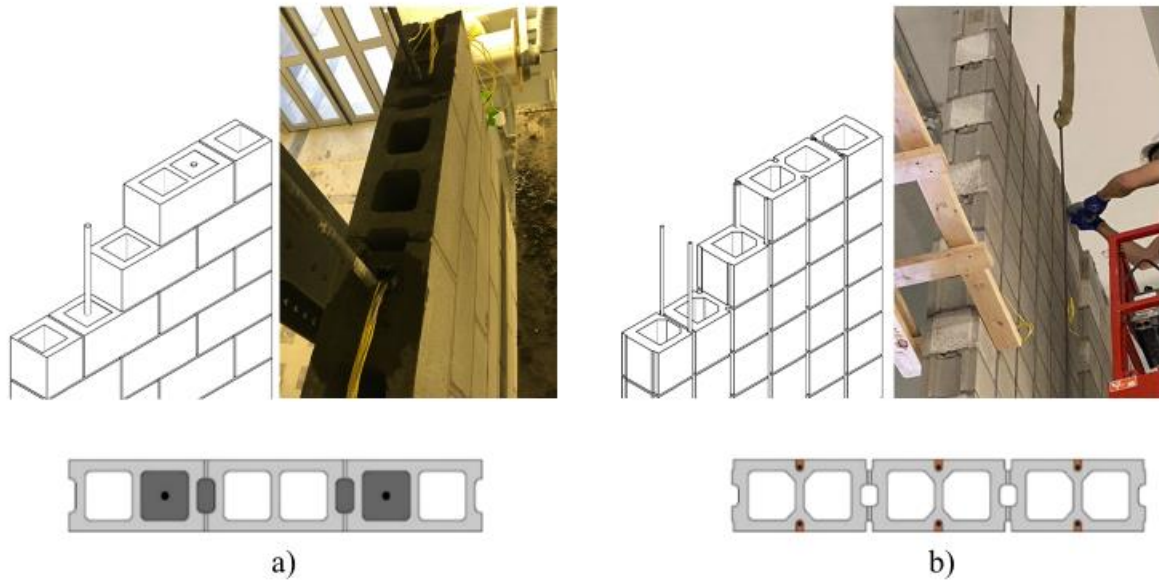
Cross sections and placement of reinforcement: a) conventional reinforcement (CH7800x); and b) NSM steel reinforcement (NH7800x)
